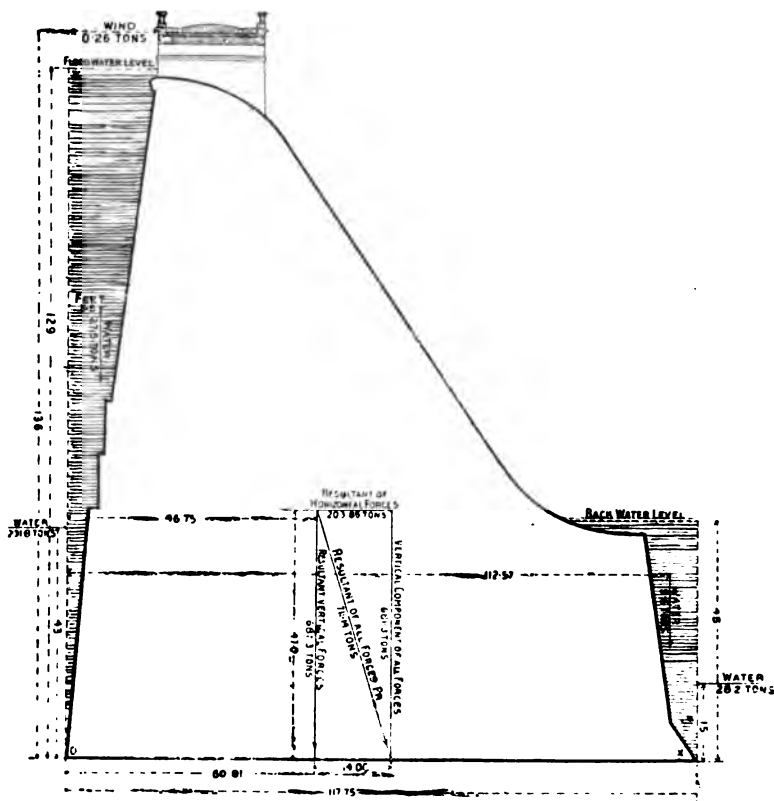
Cross-section of Vyrnwy Dam, Wales.
